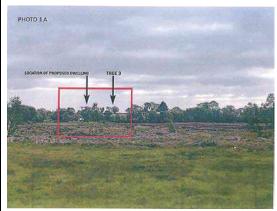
Site identified and agent has superimposed dwelling in view from Derryloughan Road/Ferry Road junction.
